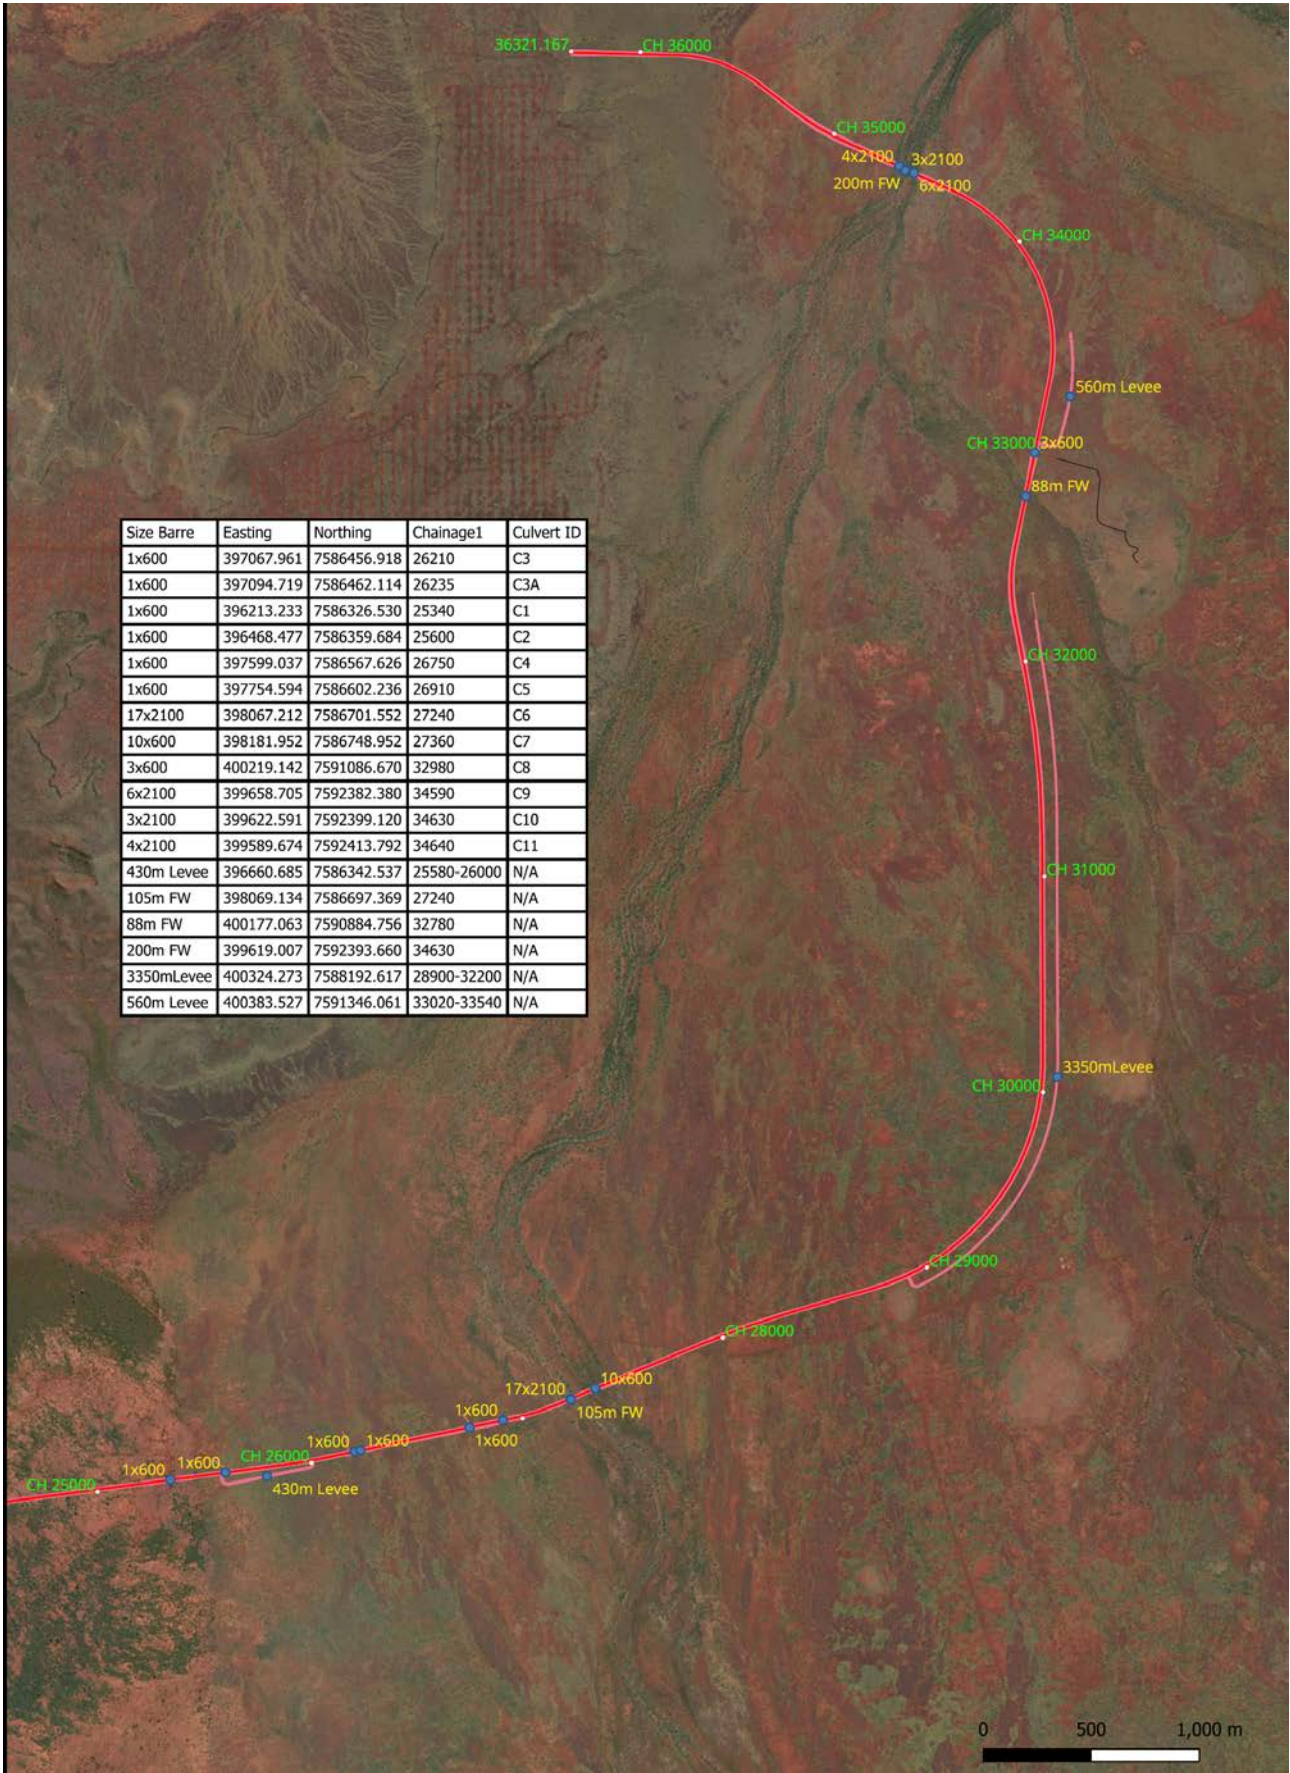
Haul Road Design Details (Supplied by Shawmac)
